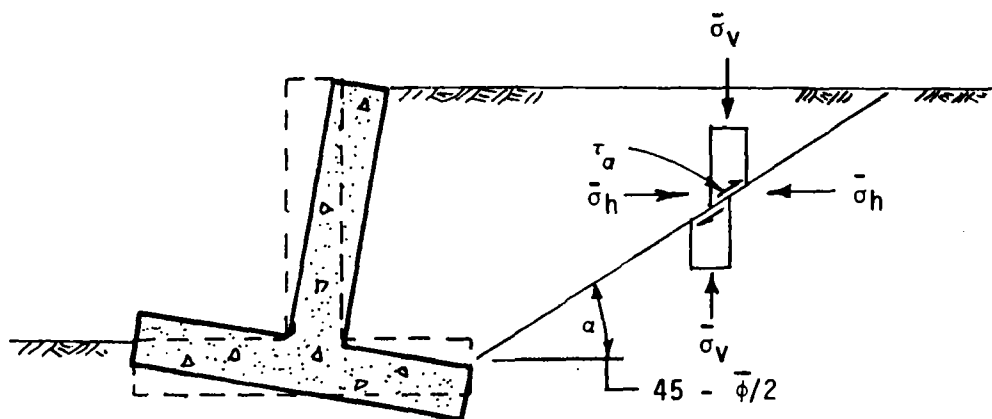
FAILING BACKFILL BEHIND INWARD YIELDING WALL
